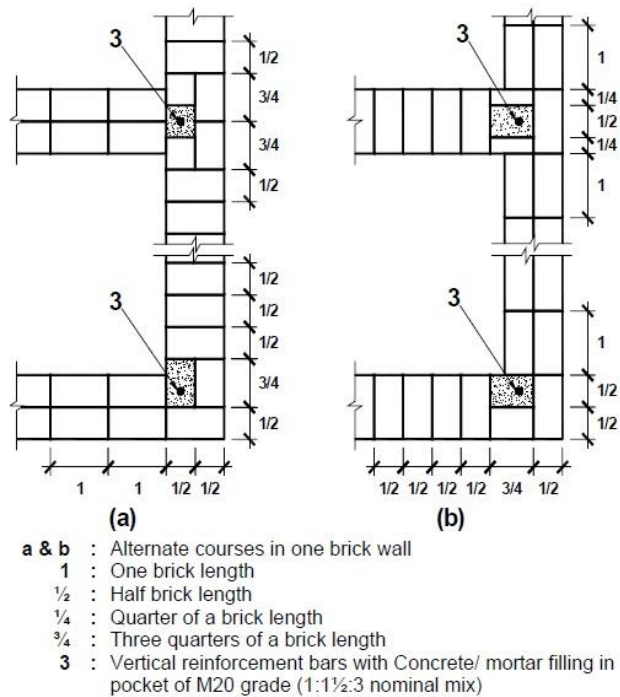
Recommended Size of Vertical Steel (Zone IV) & Typical Details of Providing Vertical Bars in Brick Masonry Buildings (Source: Earthquake Safe Construction for seismic zone IV, NDMA)
